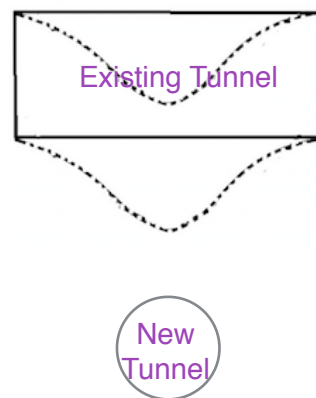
longitudinal distortion of the existing tunnel looking into section A-A
